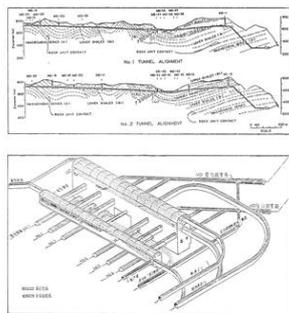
The Mingan pumped storage project in Taiwan. Powerhouse axes were finally perpendicular to the strike of the bedded sandstones, siltstones and bedding plane faults. (Liu, Cheng and Chang, 1988/Taiwan Power Company and Sinotech Inc.).
